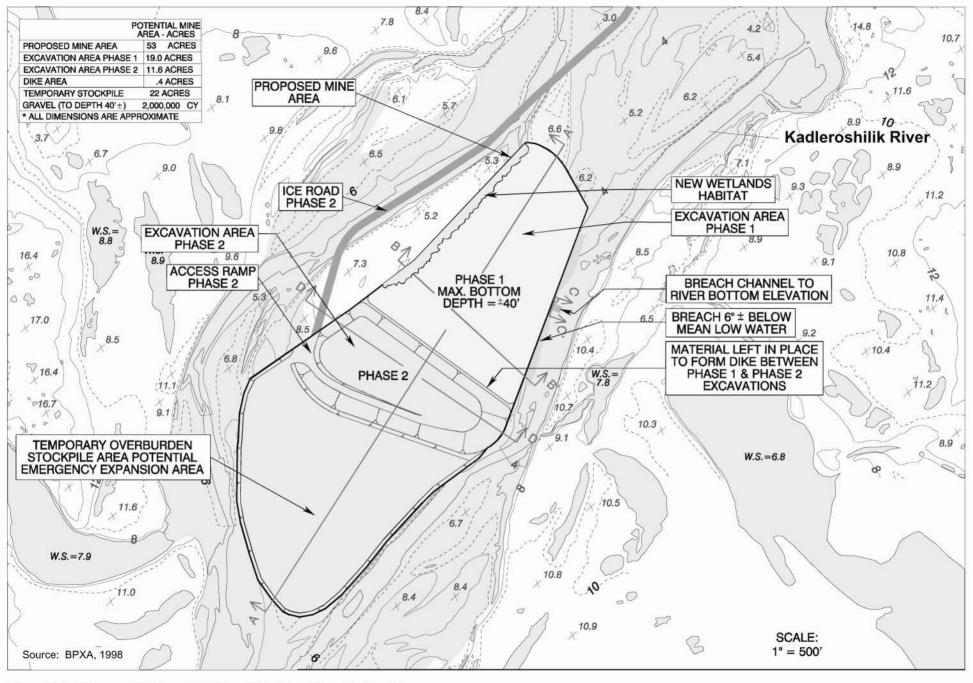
Proposed Kadleroshilik River Mine Site - Phase II - Plan View
